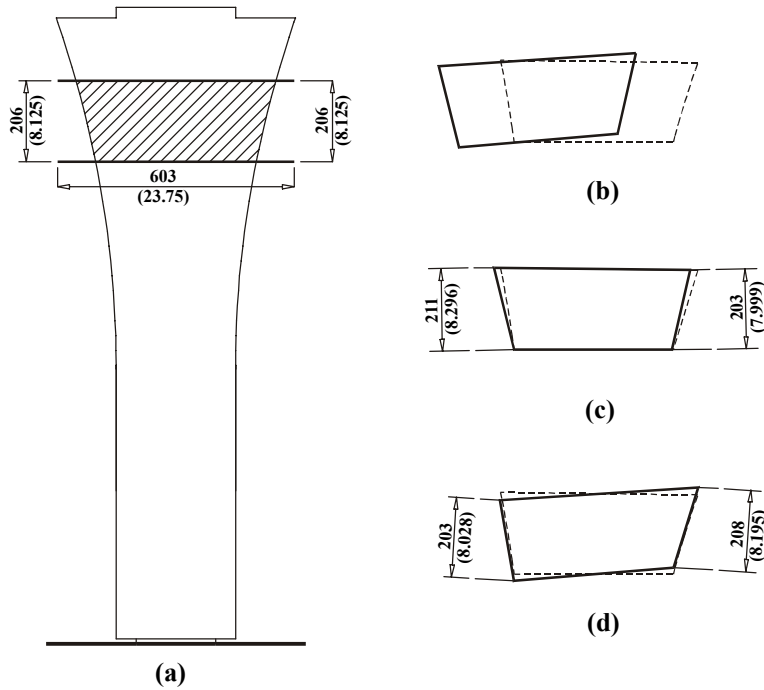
Curvature Calculations (a) Section 3 for East Column (b) Final Deformed Shape (c) Horizontal Deformations (d) Vertical Deformations
